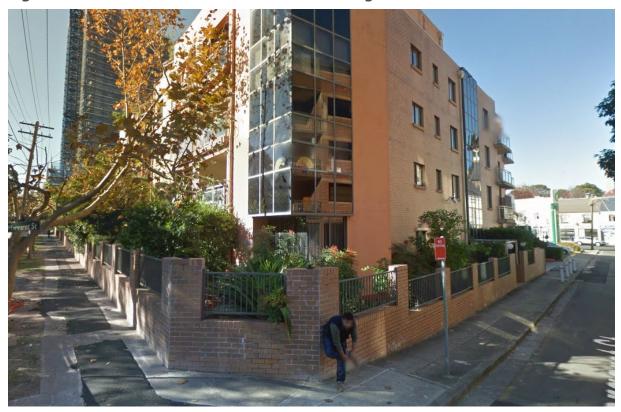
View of the site from the corner of Margret Street and Gibbons Street
